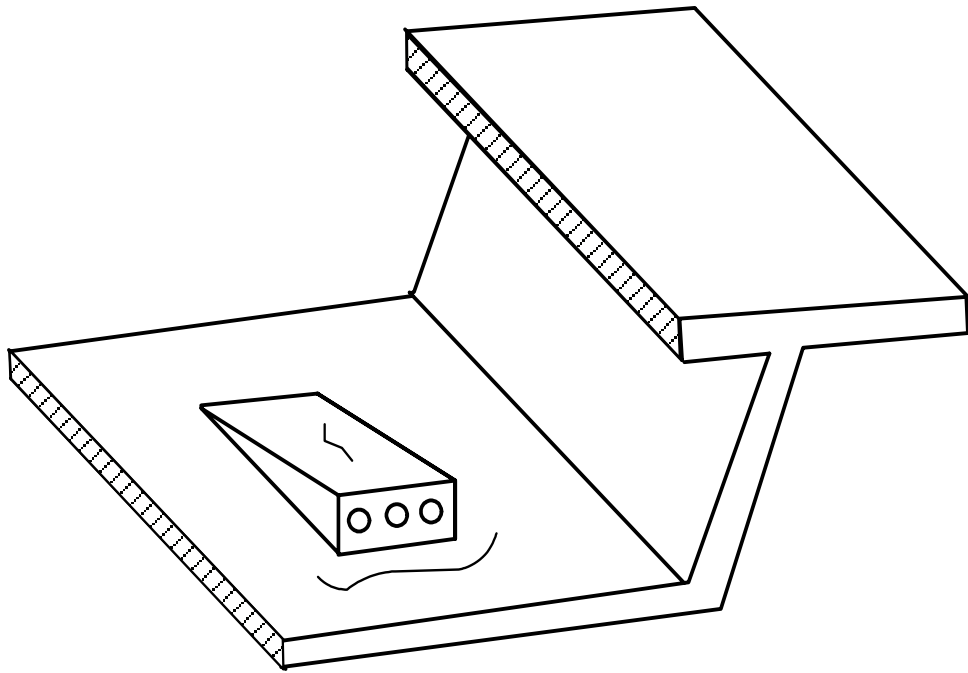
Segmental Box Girder Cracks Adjacent to Anchorage Block
